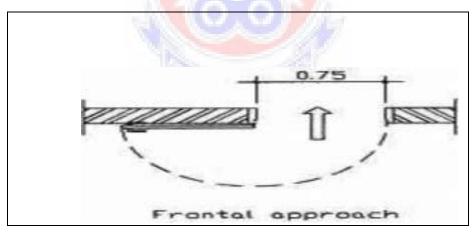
; Minimum interior door opening size (Source: SOLIDERE, 2004
